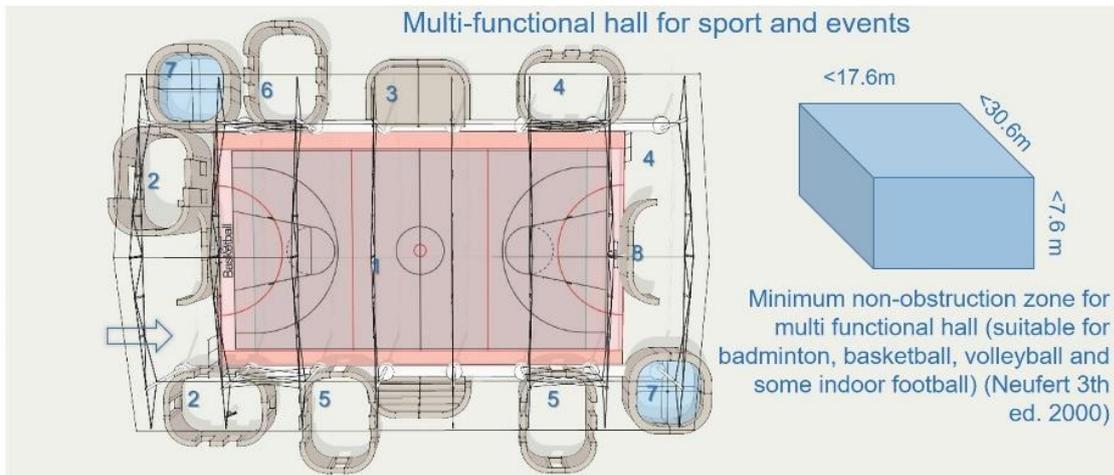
Floor plan configurations of pilot concept design of a big multifunctional hall
